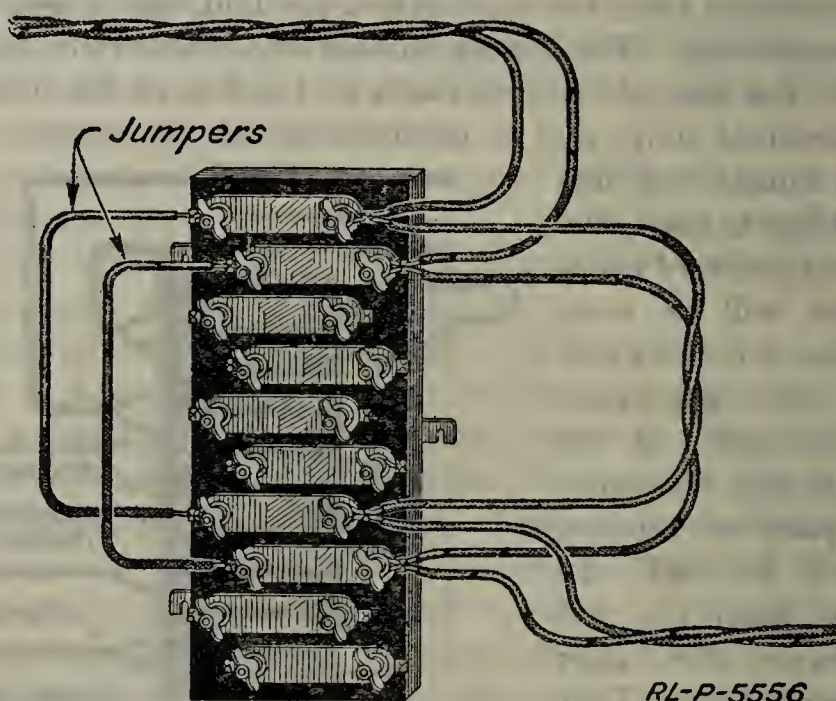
Method of connecting wires to terminal strip in construction of test station after initial installation
